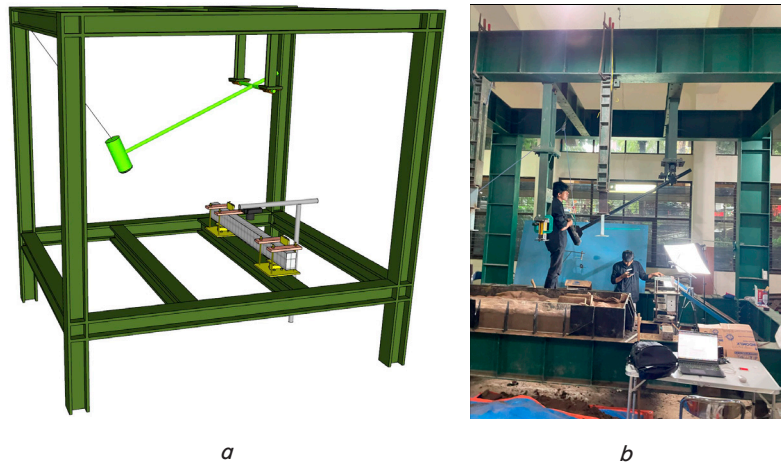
Pendulum device used for impact testing of concrete specimens: *a* – frame for load testing model; *b* – construction and equipment setup in structural laboratory
